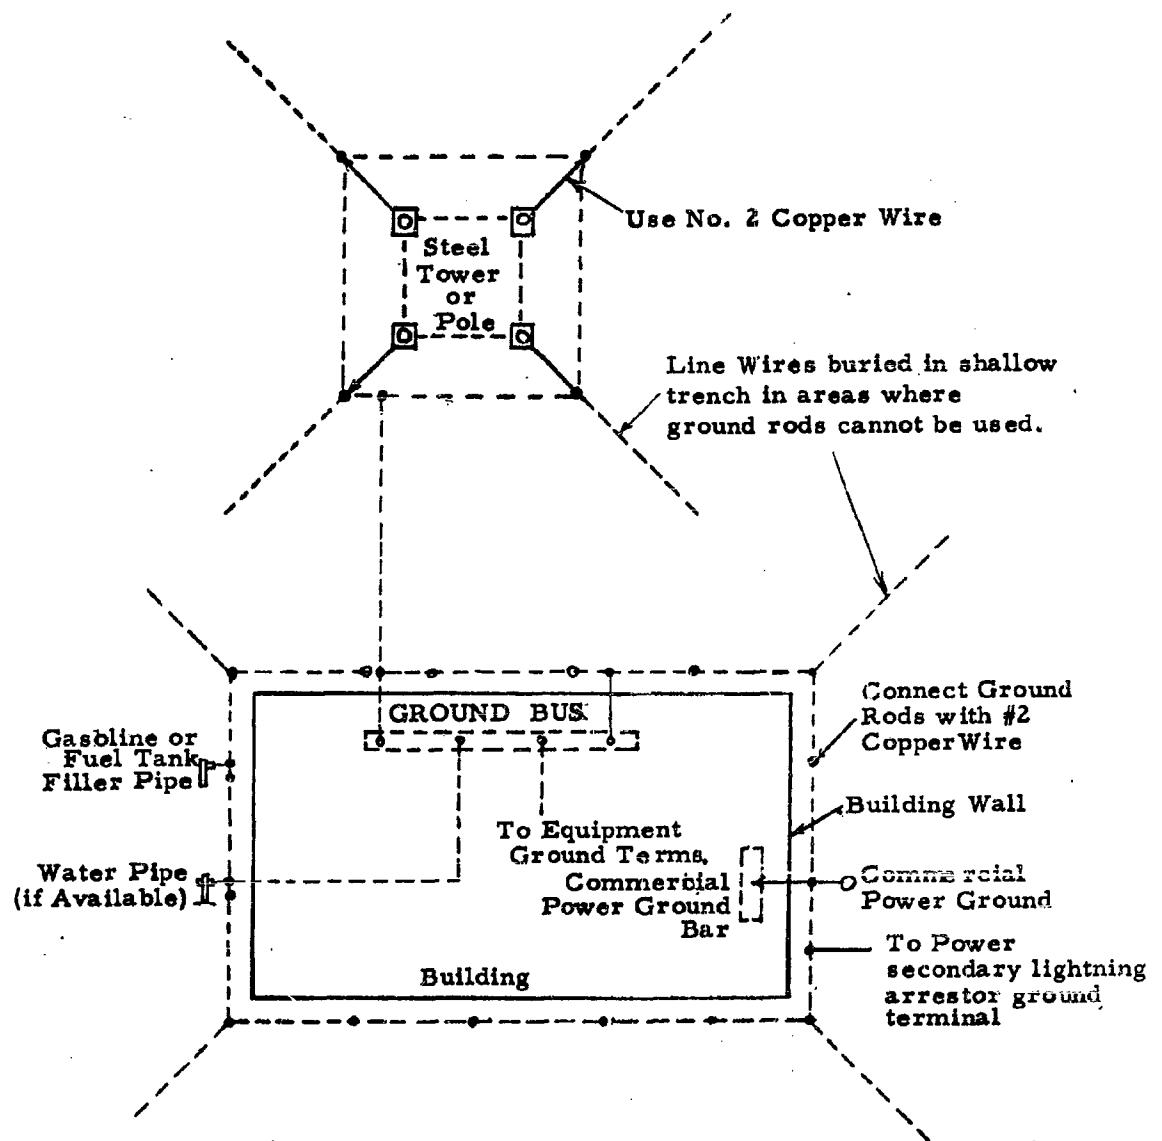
GROUNDING ARRANGEMENT - FIXED BUILDING AND ANTENNA FOUNDATION.
